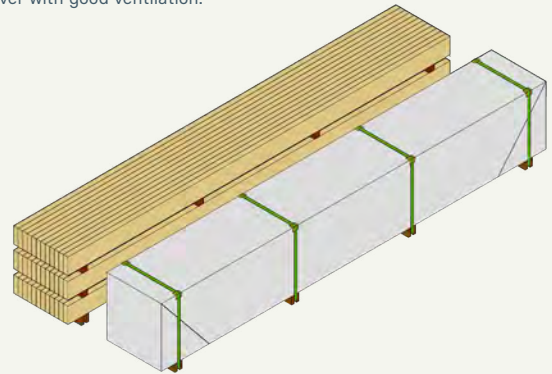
Elevate packs at least 300mm above ground level using timber bearers that support the full width of the pack
